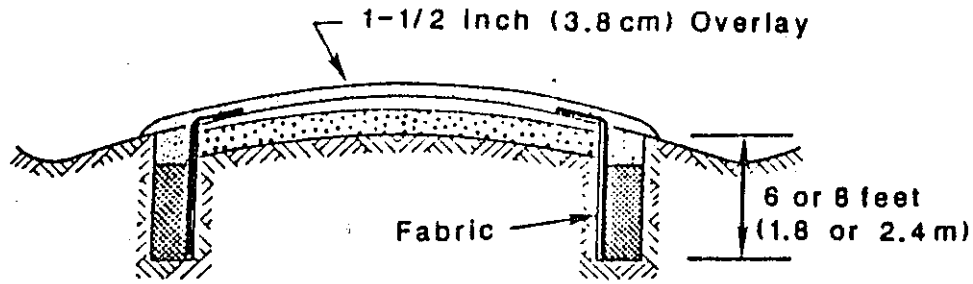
Cross-Section of Vertical Fabric Barrier Placement.
